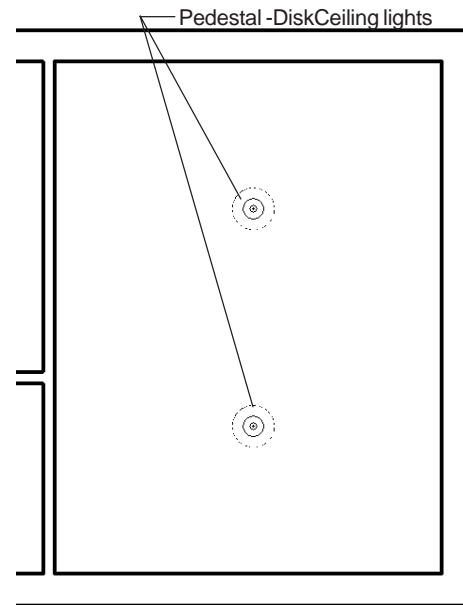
Sketch ceiling plan for adding ceiling lights to the living room
